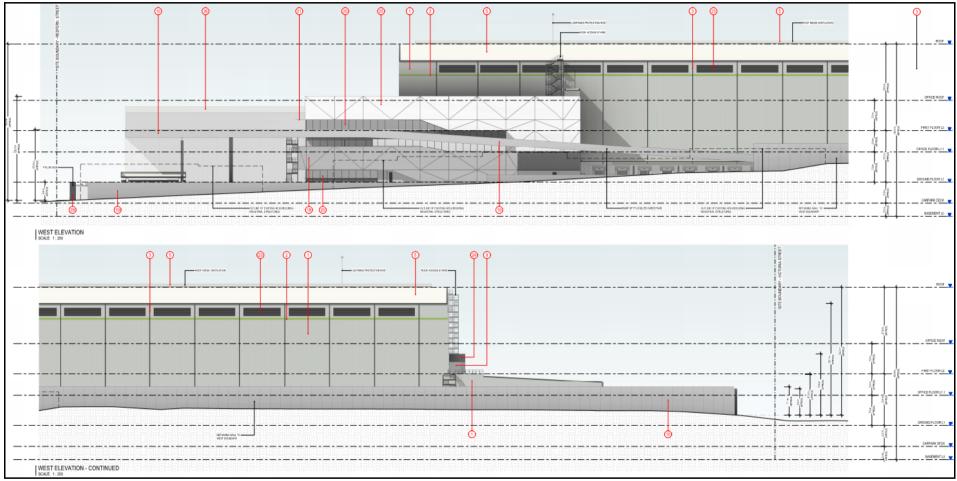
Proposed West Elevation (Watson Young Architects, 2021)
